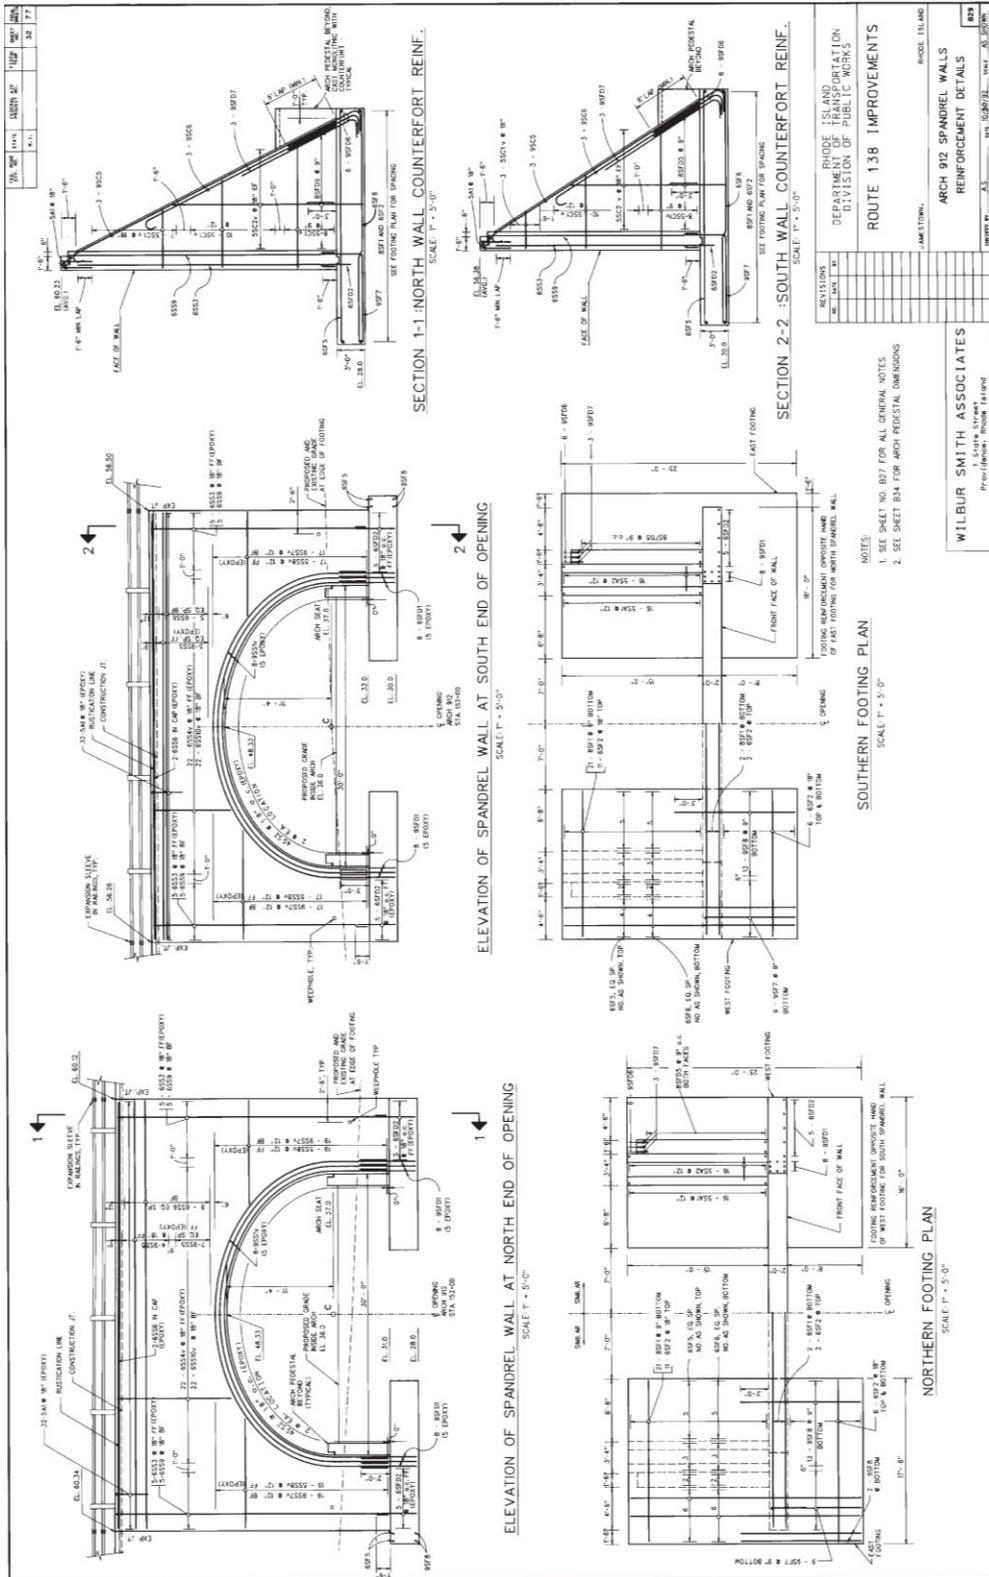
Arch IV Construction Plan I (provided by RIDOT)
